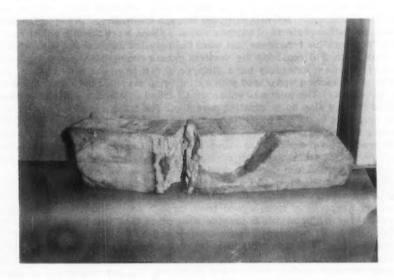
BEAM WITH BREAK BETWEEN TWO PATCHED SECTIONS
